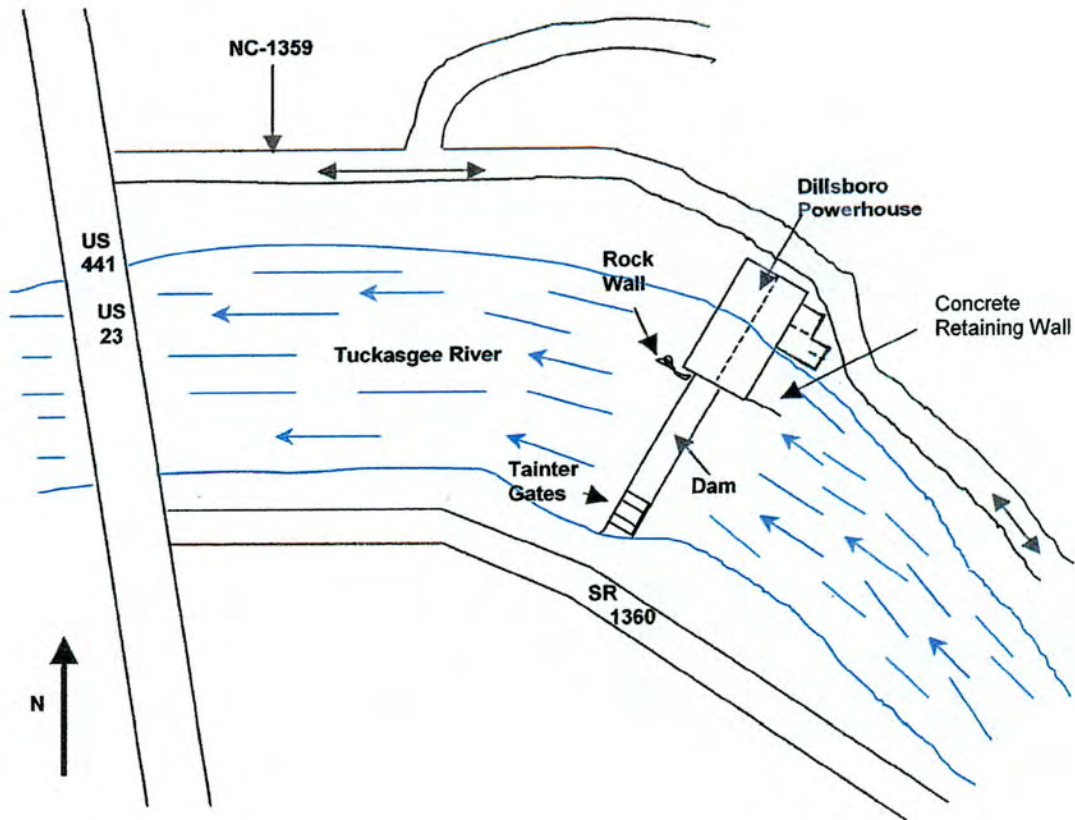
Dillsboro Dam and Powerhouse Site Plan.
